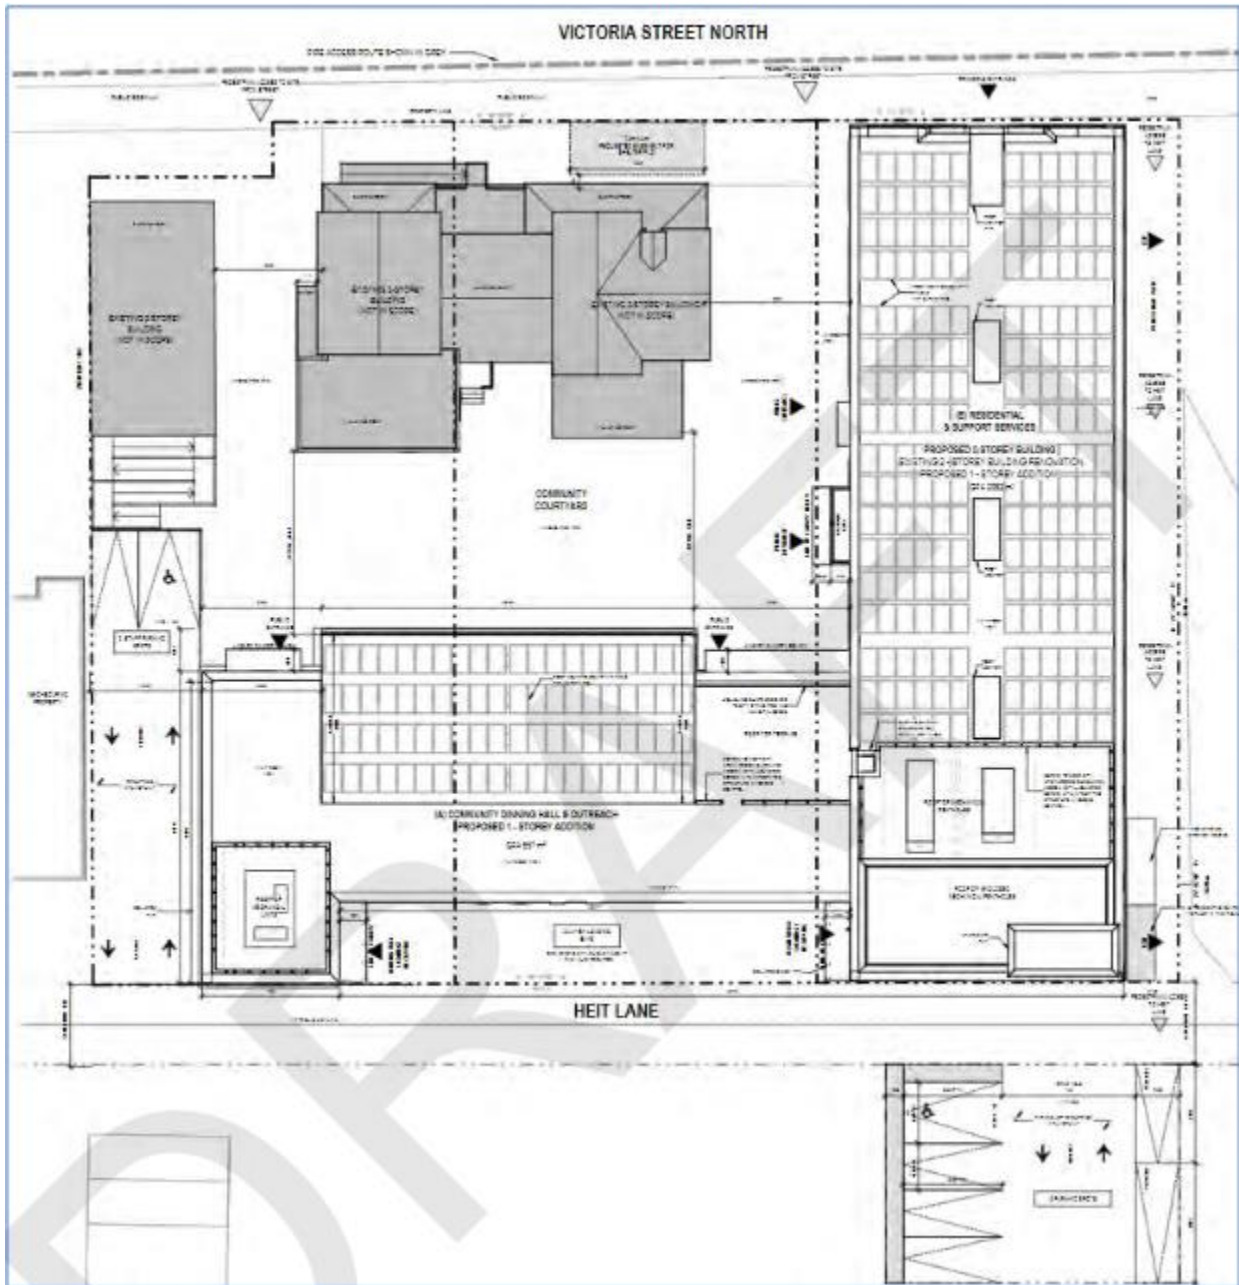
Proposed Site Plan for 83-97 Victoria Street North.
